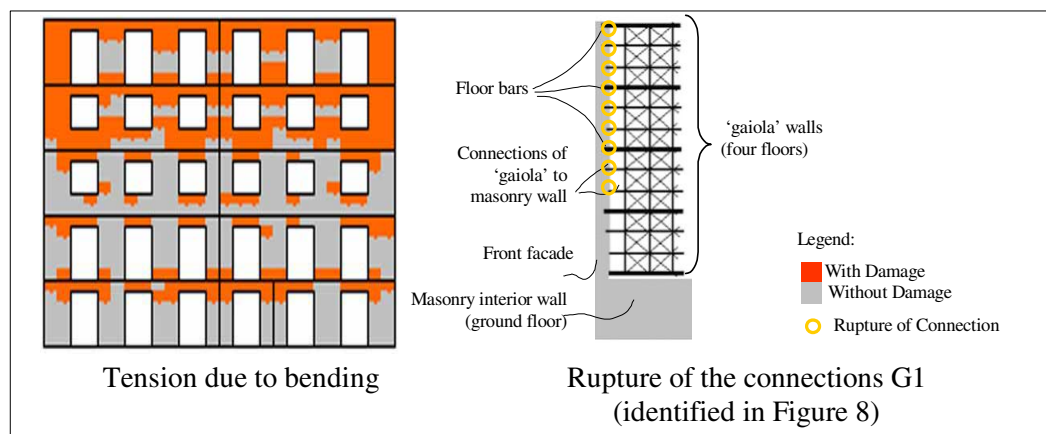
Masonry damages and the rupture of connections that allowed identifying the bending of the front façade collapse mechanism (Cardoso *et al.* [1])
